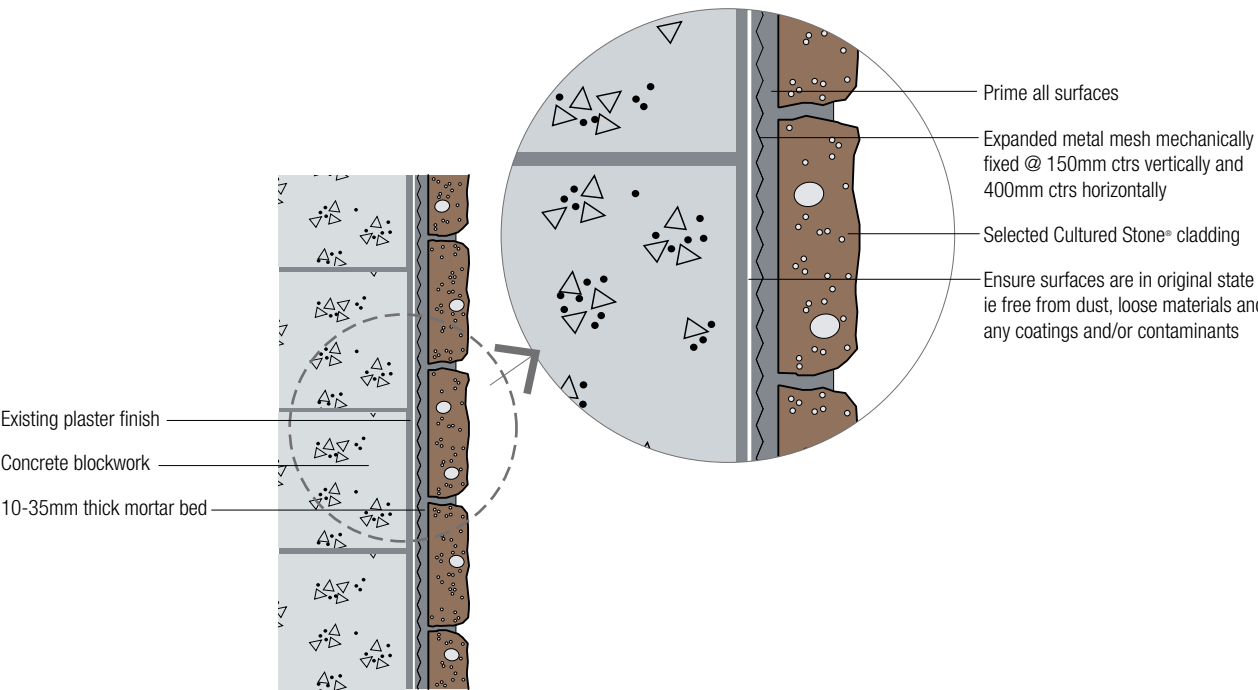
Plastered Internal Masonry Wall - Section (Dwg # CS-05.03)
